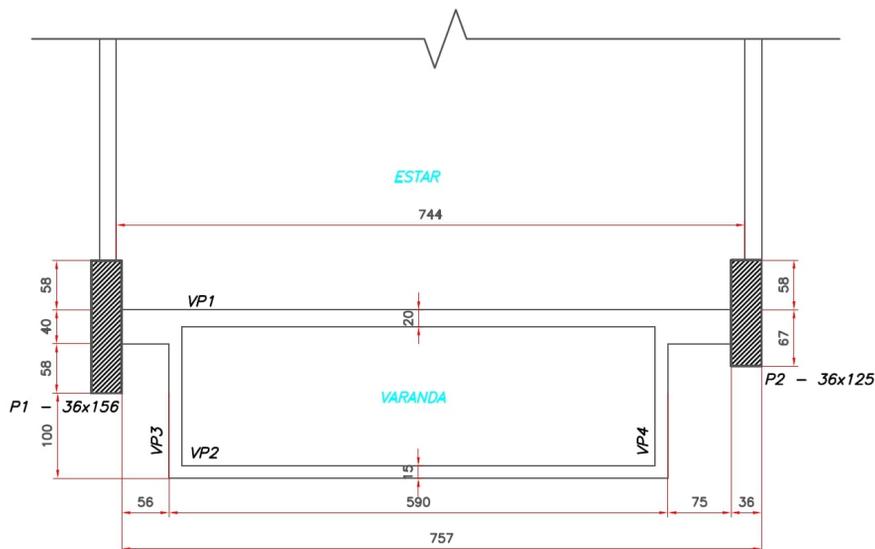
Example of indirect support situation with application of torsion in the supporting beam (dimensions in cm)
